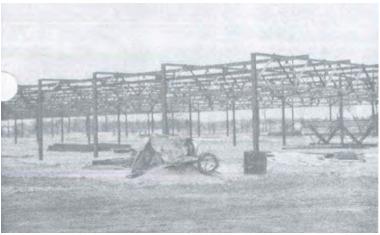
Construction of the GE Lamp Plan, 1946. (Source: GE Lighting)
